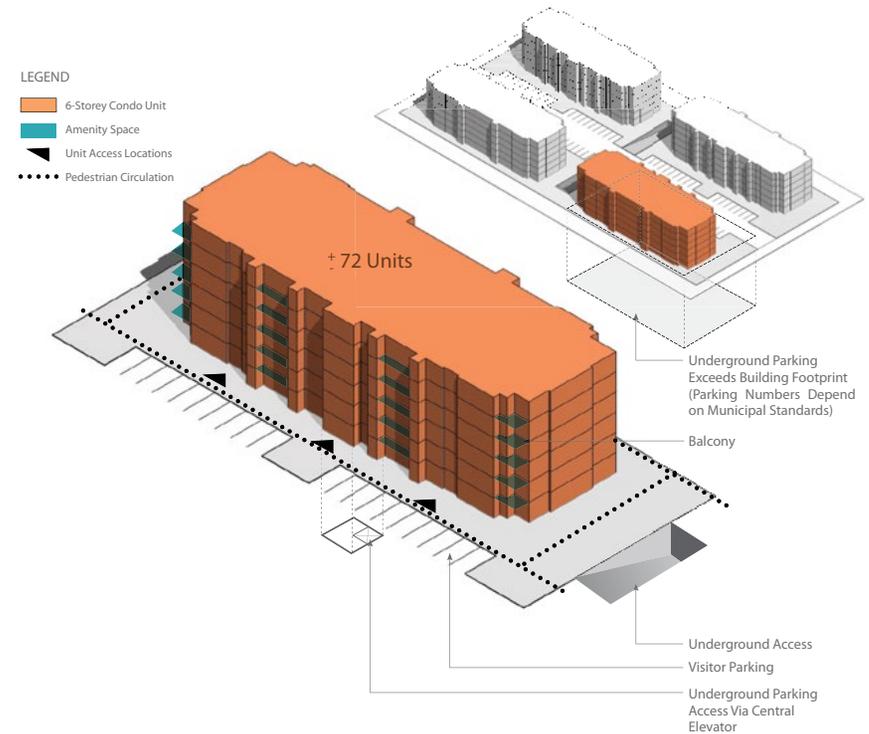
Conceptual massing of mid-rise apartment buildings
